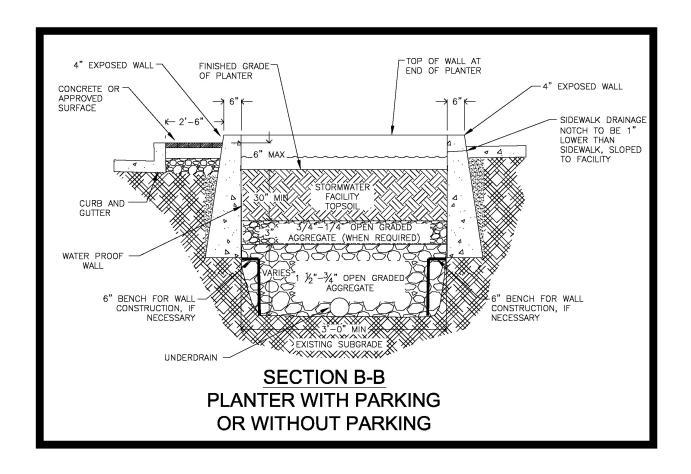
Green Streets Planter Section View With or Without Parking (source: Portland, 2011)
